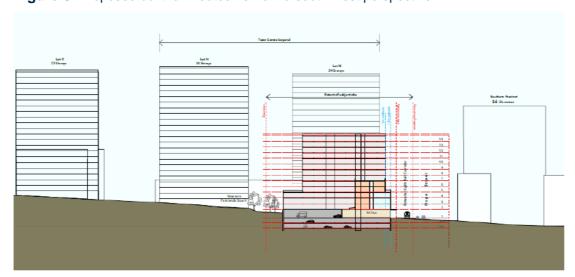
Section of the site viewed from the west showing the proposed built form in the broader Melrose Park North context
